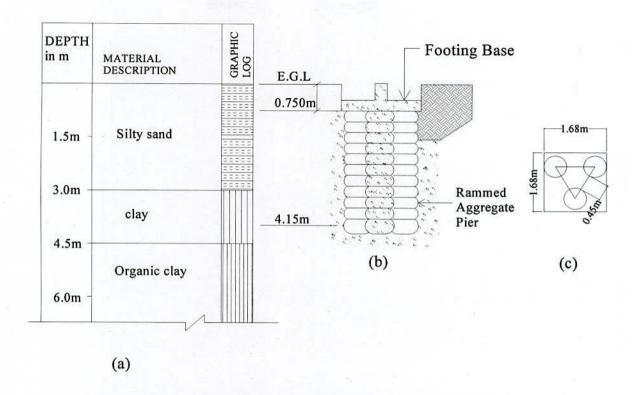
Footing placed on group RAP treated ground: (a) Sub-soil profile, (b) Section of installed group RAP under footing and (c) Plan of group RAP
